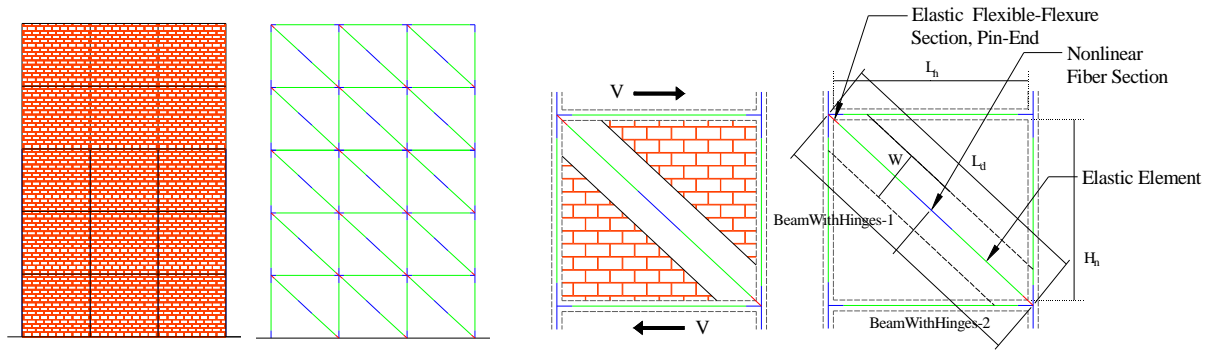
Structural idealization of masonry infill RC frame wall (left) and details of masonry infill macro-modeling (right).
